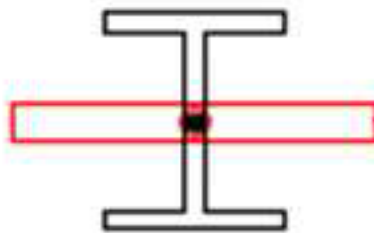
Cross sectional view of one beam element drawn align the deck plane in SAP2000. Diggelmann, L. M., et al. (2012). Evaluation of Member and Load-Path Redundancy on the US-421 Bridge over the Ohio River. Purdue University. Used under fair use, 2015.
